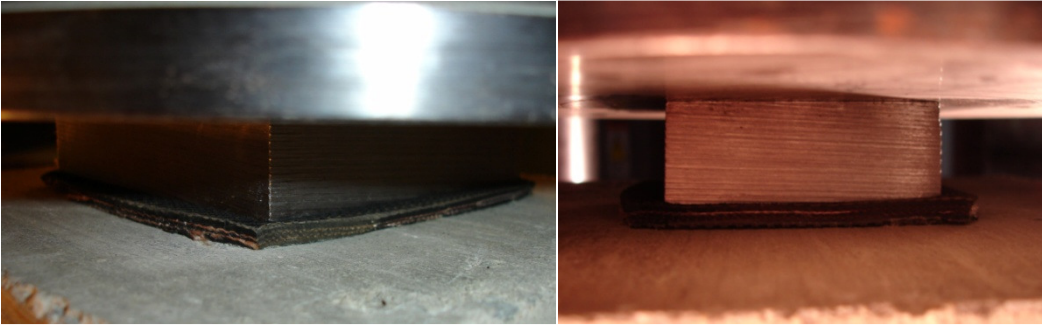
Bearing Pad Expansion under 4 inch and 2.5 inch bearing pad
